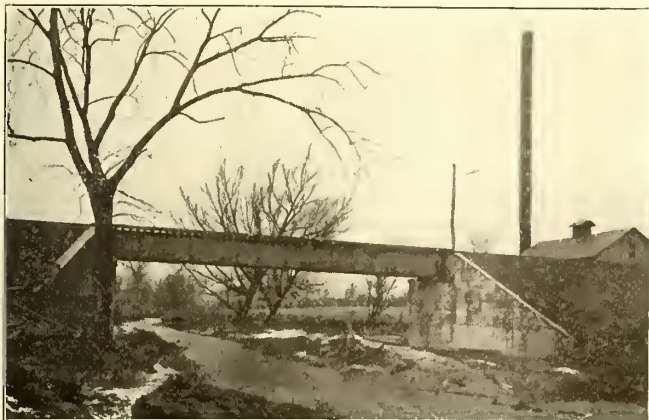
Boyertown & Pottstown Railway—Plate Girder at Emergency Power House
